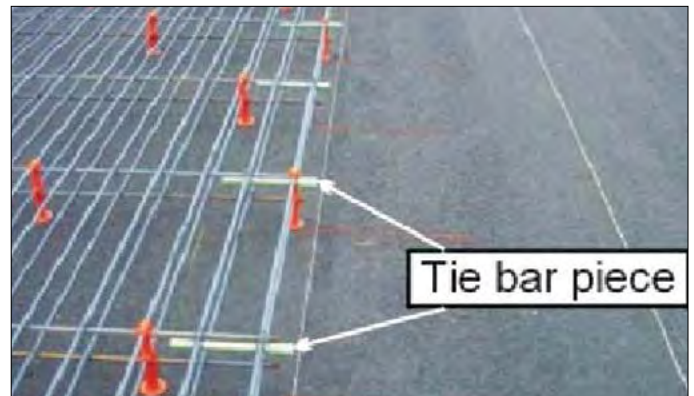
Two-piece threaded tie bars for longitudinal construction joint.
